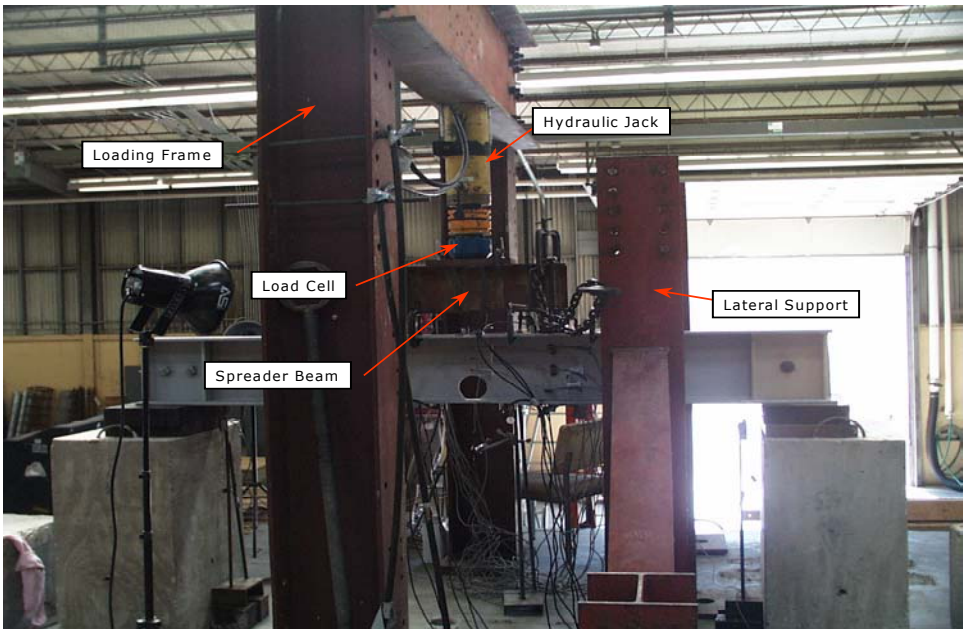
Four-Point Bending Test Specimen. Instrumentation.
